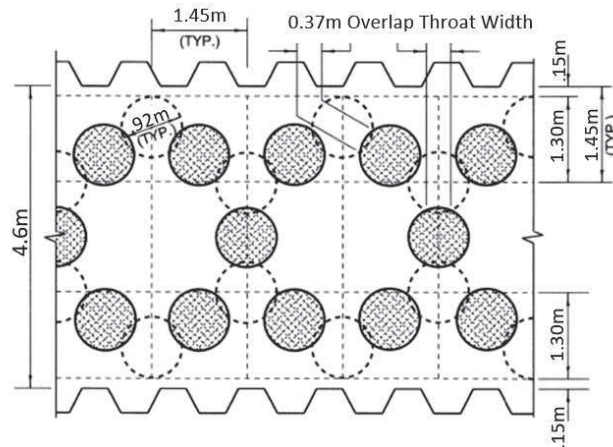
Typical plan view of upgraded levee with double sheet pile walls and DSCM columns
